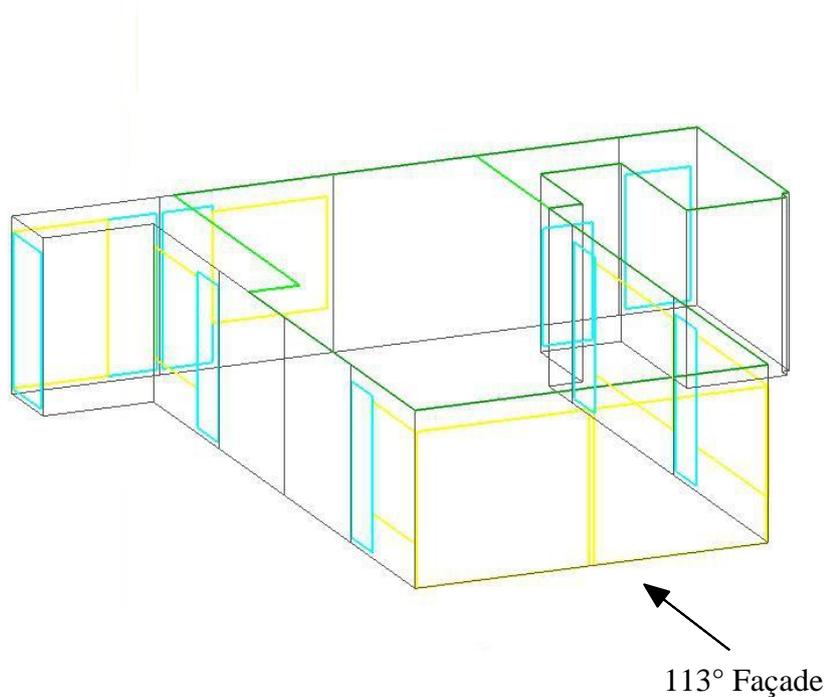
Actual building Open Plan Office 2 zone wireframe representation.
